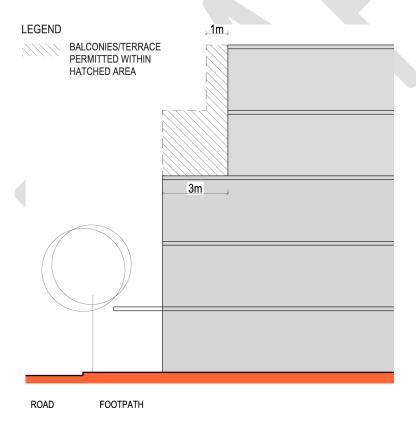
Upper Level Setbacks and balcony locations
